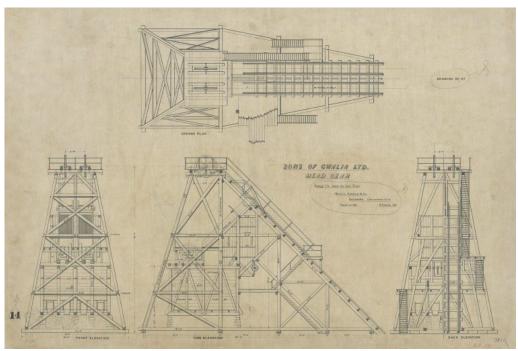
Plans and elevations for the Sons of Gwalia inclined Headframe, 1898. Courtesy SLWA b2125807_4.
